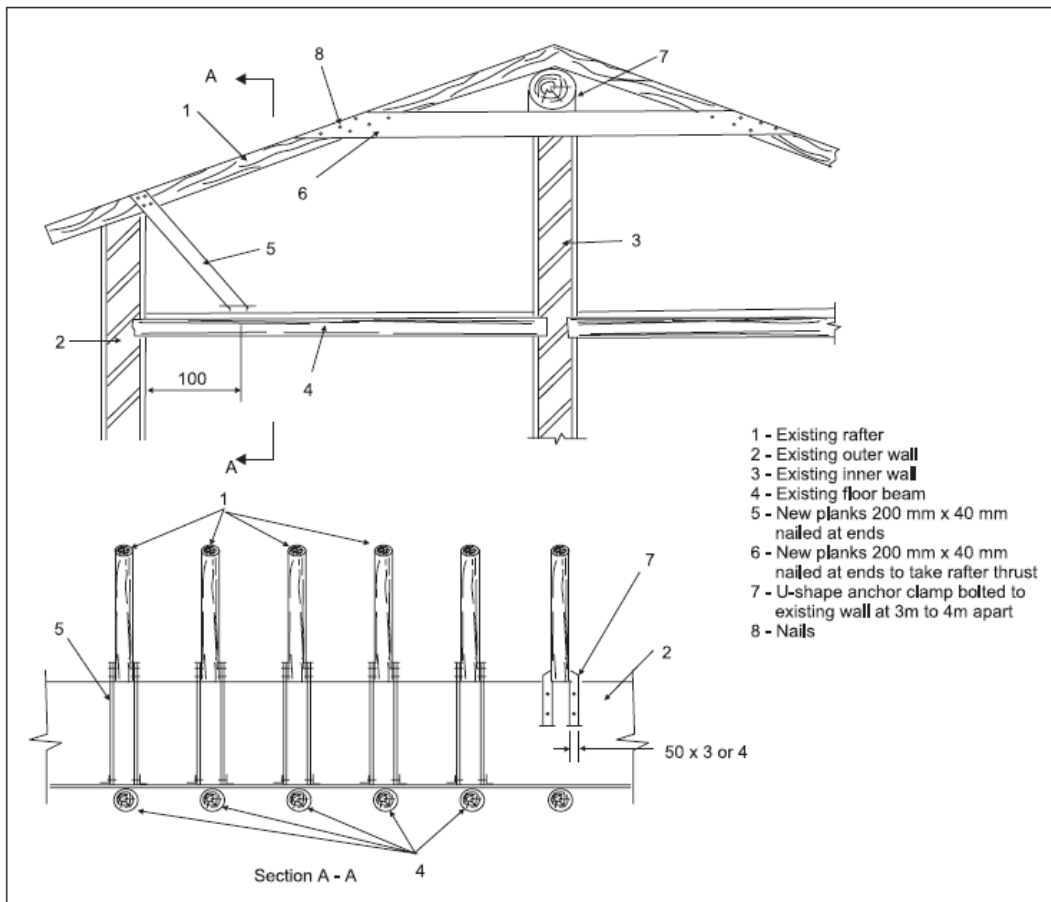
Roof modification to reduce thrust of walls
